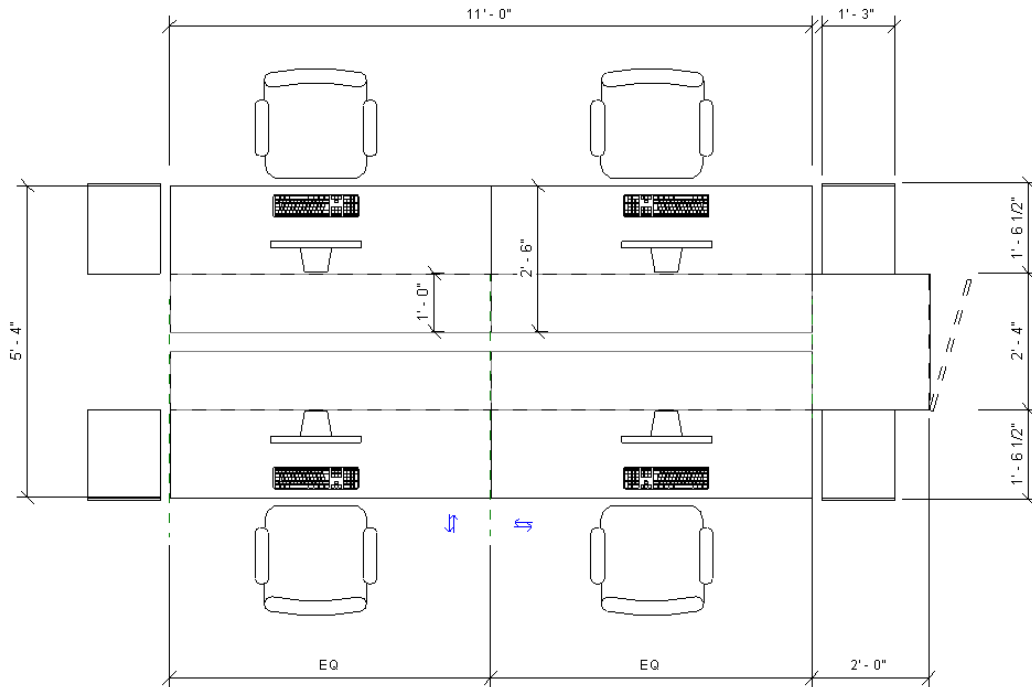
Typical Workstation in Plan View, NTS, from KGB Maser Revit Desk Family
